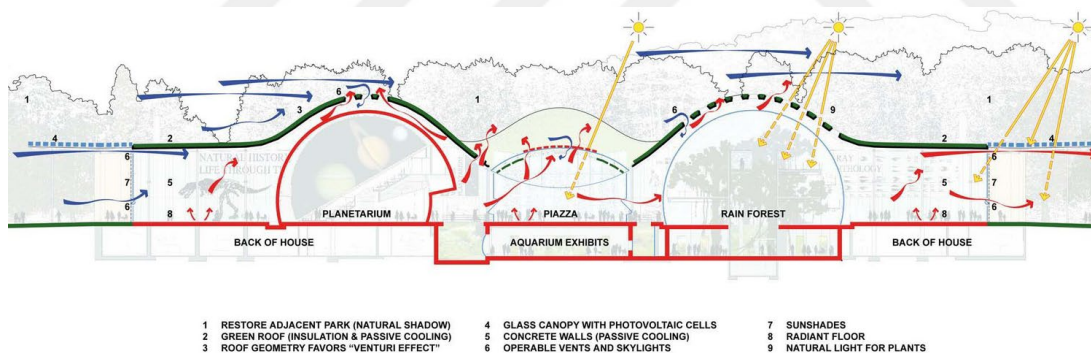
Bioclimatic Section of California Academy of Sciences (Renzo Piano Building Workshop, Stantec Architecture, 2008).
